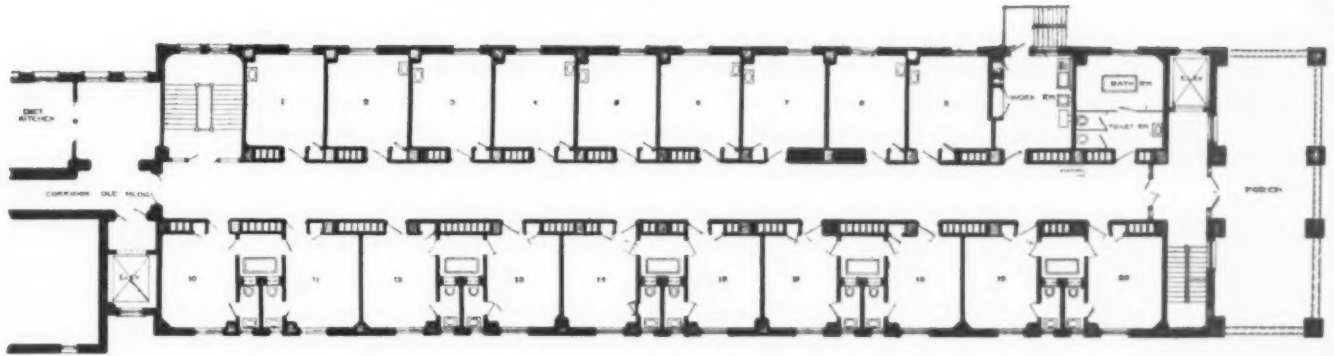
St. Joseph's Hospital, Chicago. Typical plan.
